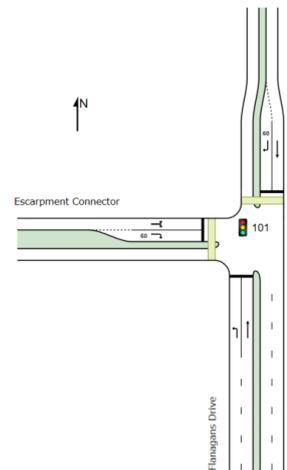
IN-04 Adopted Intersection Layout (Previous)
